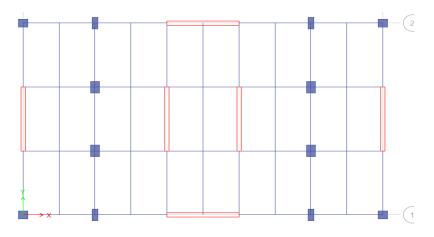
Plan view of RC frame model with Shear Wall in ETABS
